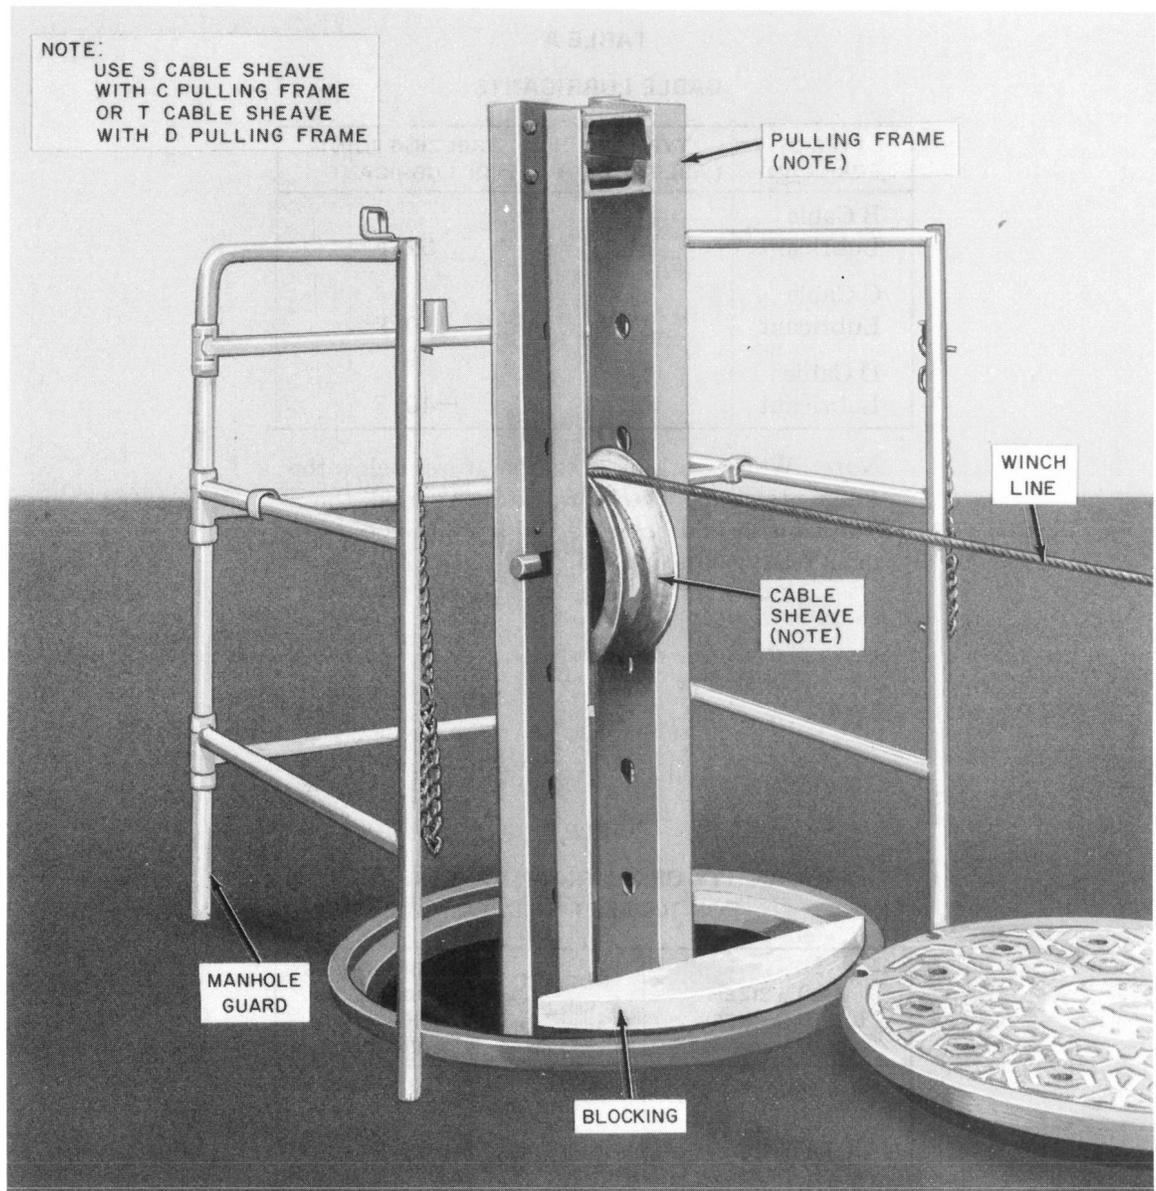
View Above Manhole of Pulling Frame and Cable Sheave Arrangement
